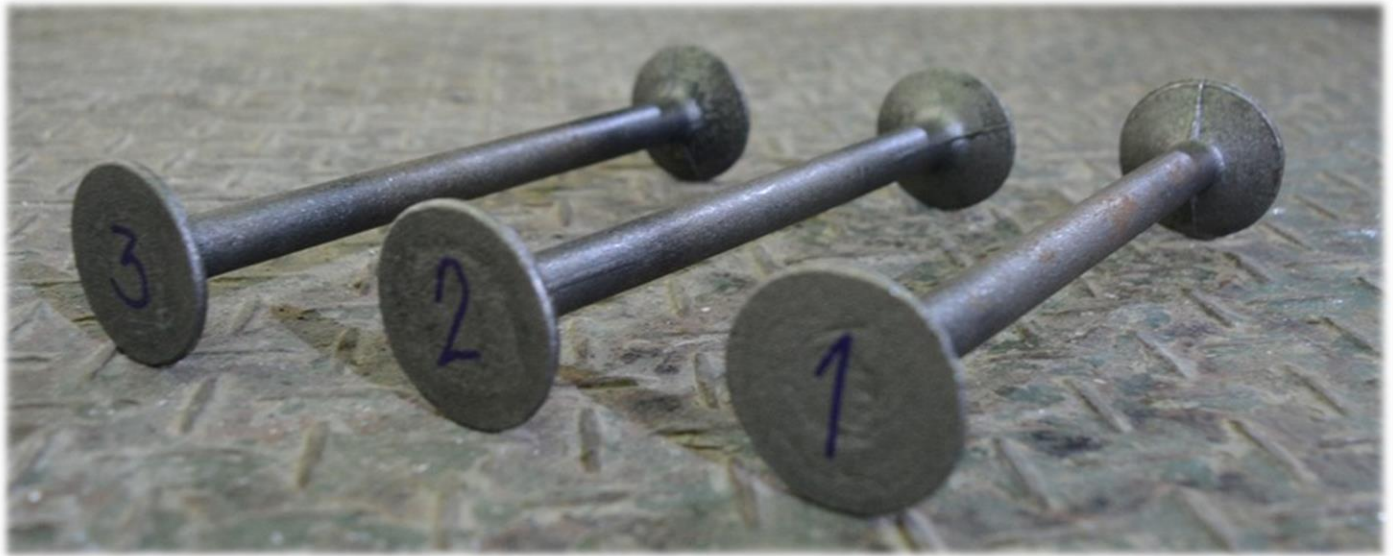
Final Failure Mode of Shear Stud Slab Specimen
